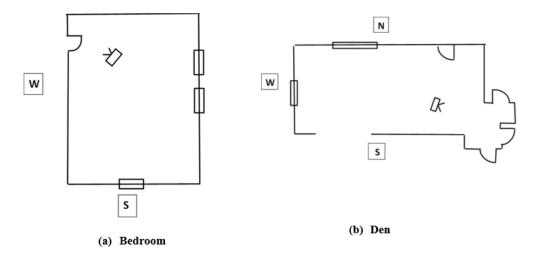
Floorplans of the Rooms for Loudspeaker Placement Tests
